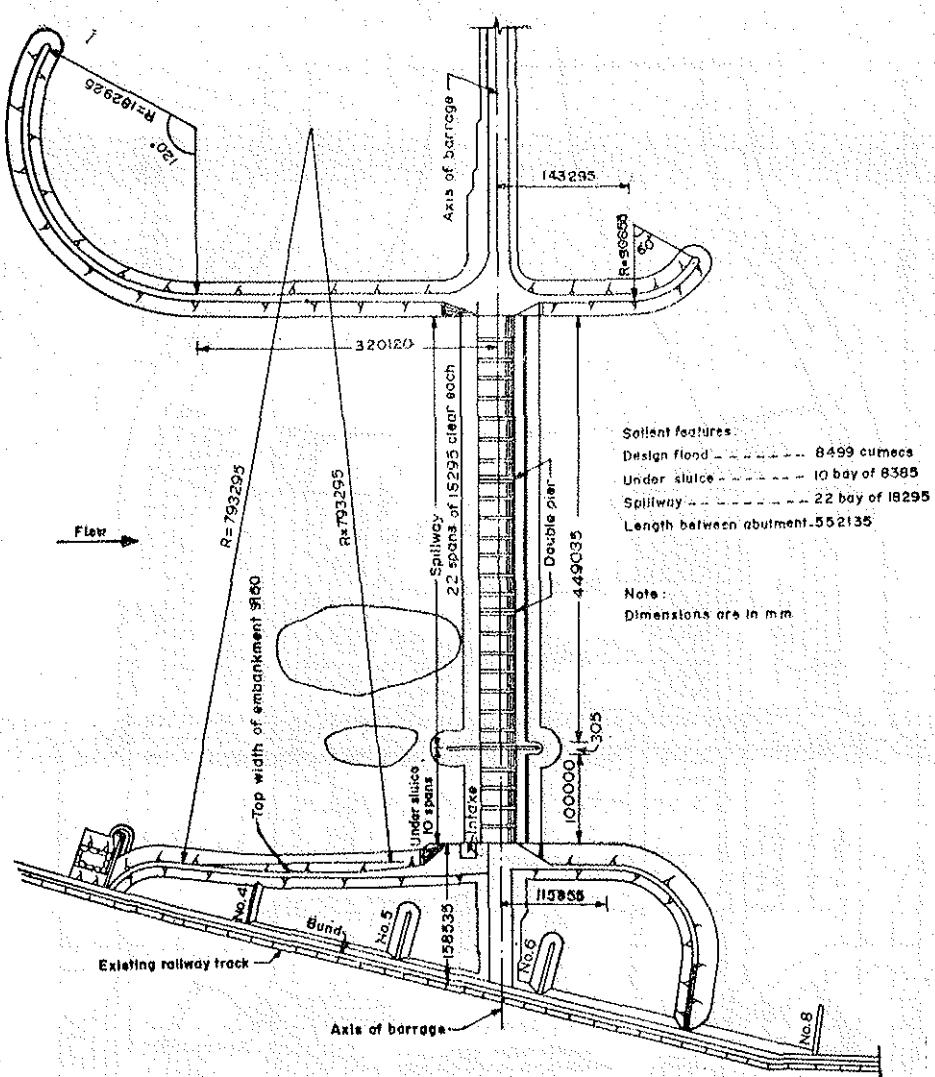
Detailed Layout Plan of Yamuna Barrage.
